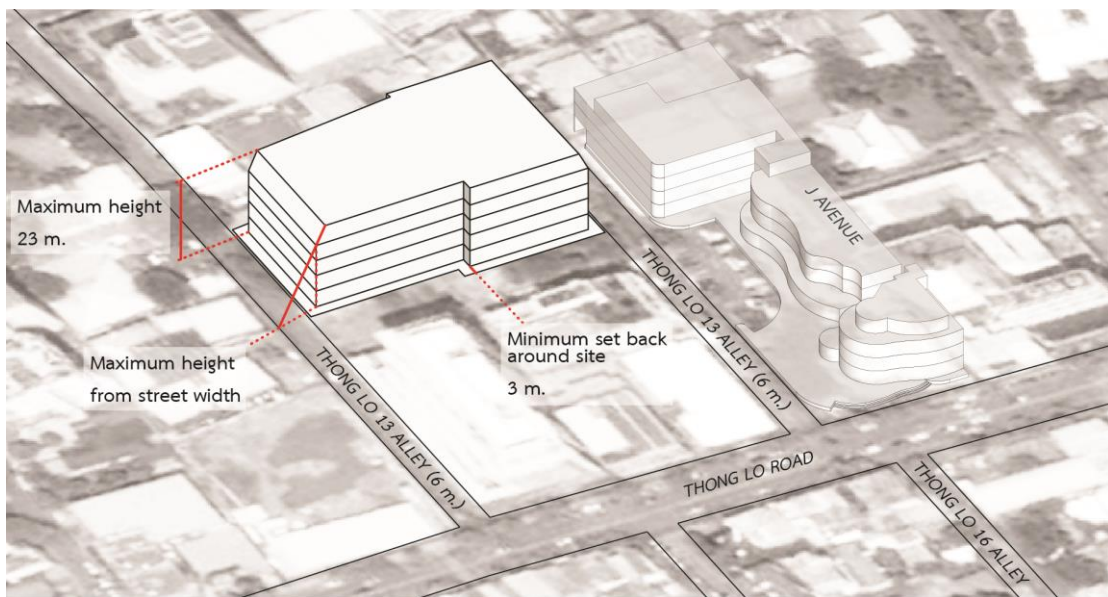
Maximum building footprint of the chosen site, Thong Lo, Bangkok.
